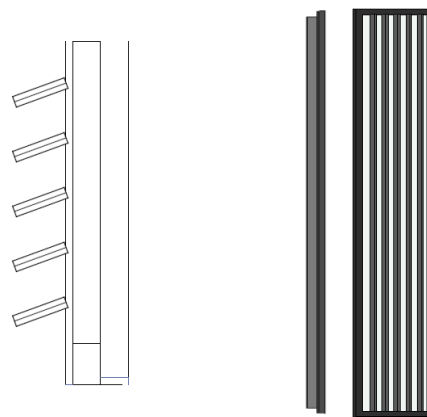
View on Plan (a), Side Elevation (b), and Front Elevation (c) of the Installed Vertical Shading on the Opening.
